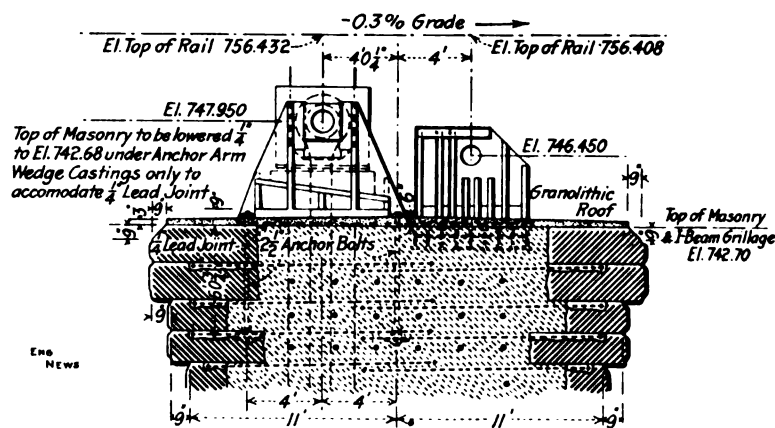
TOP OF PIER 4 (NORTH ANCHORAGE), SHOWING SHOES OF ANCHOR SPAN AND APPROACH SPAN IN PLACE.
